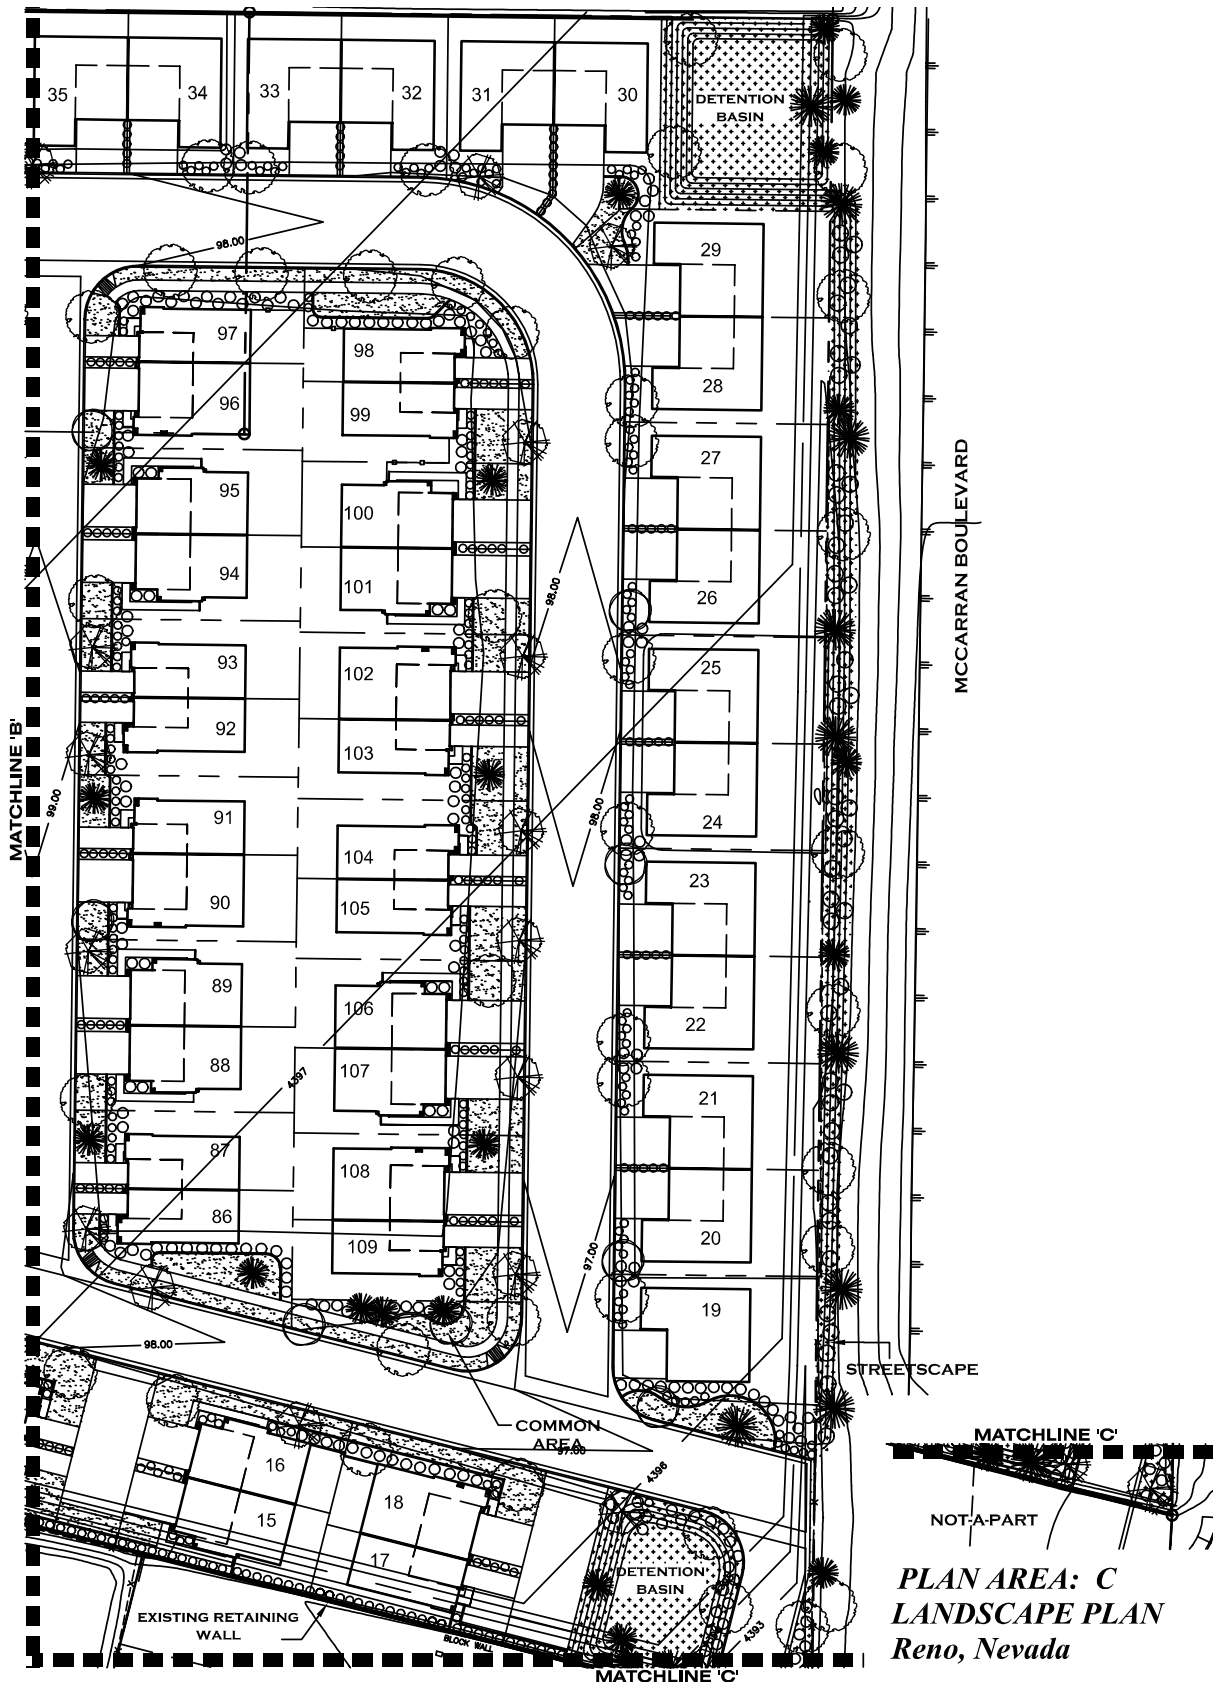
McCARRAN BLVD. STREETSCAPE PLAN
